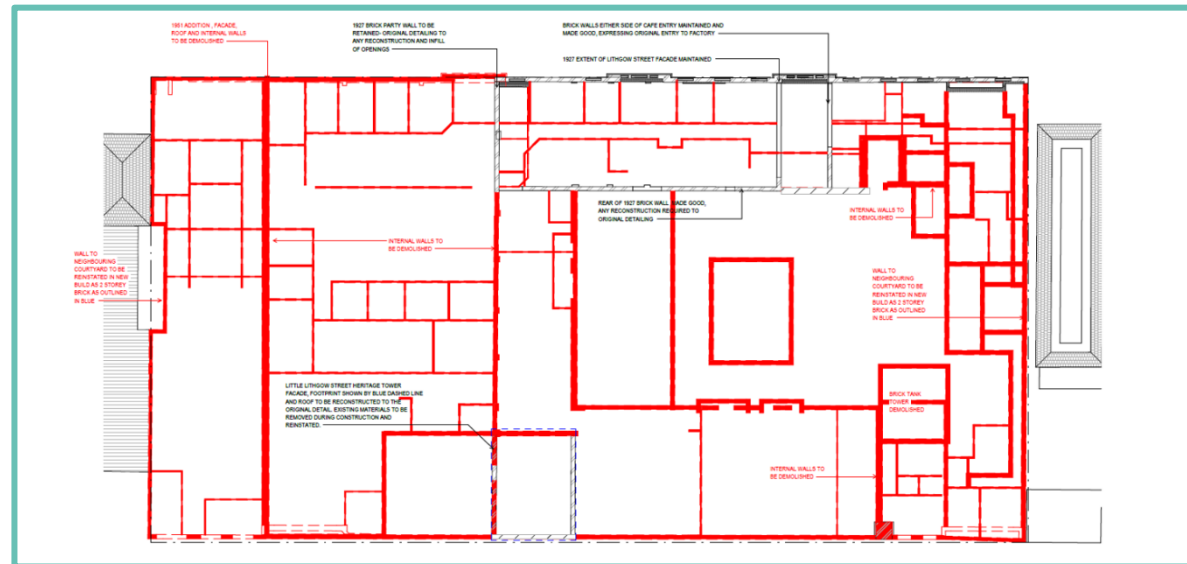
Site demolition plan (first floor). Source: Warren and Mahoney.
